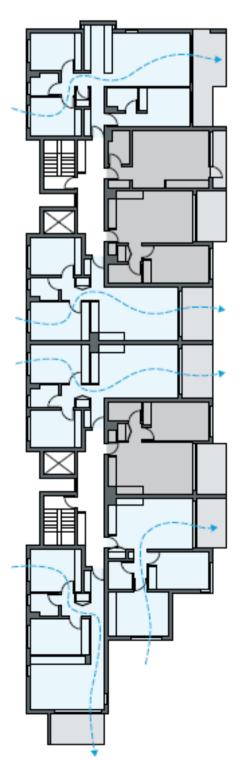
B.8 The floor plan above demonstrates one approach for how five of a total of eight apartments achieve natural cross ventilation
